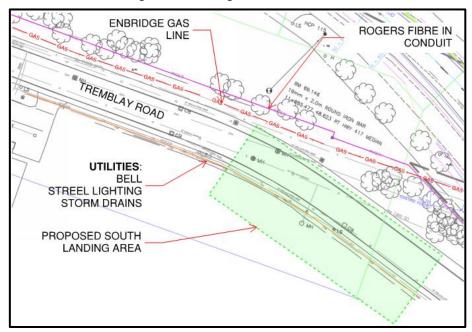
Utilities within vicinity of construction area at Tremblay Road
